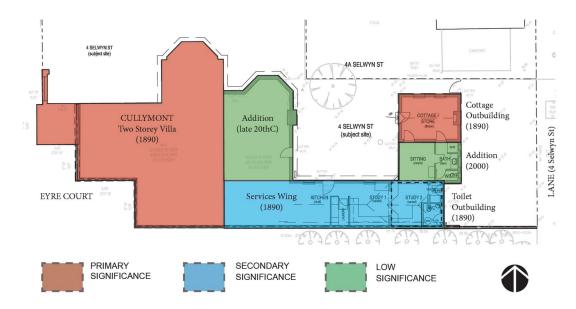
Existing Conditions floor plan, showing the levels of significance.
